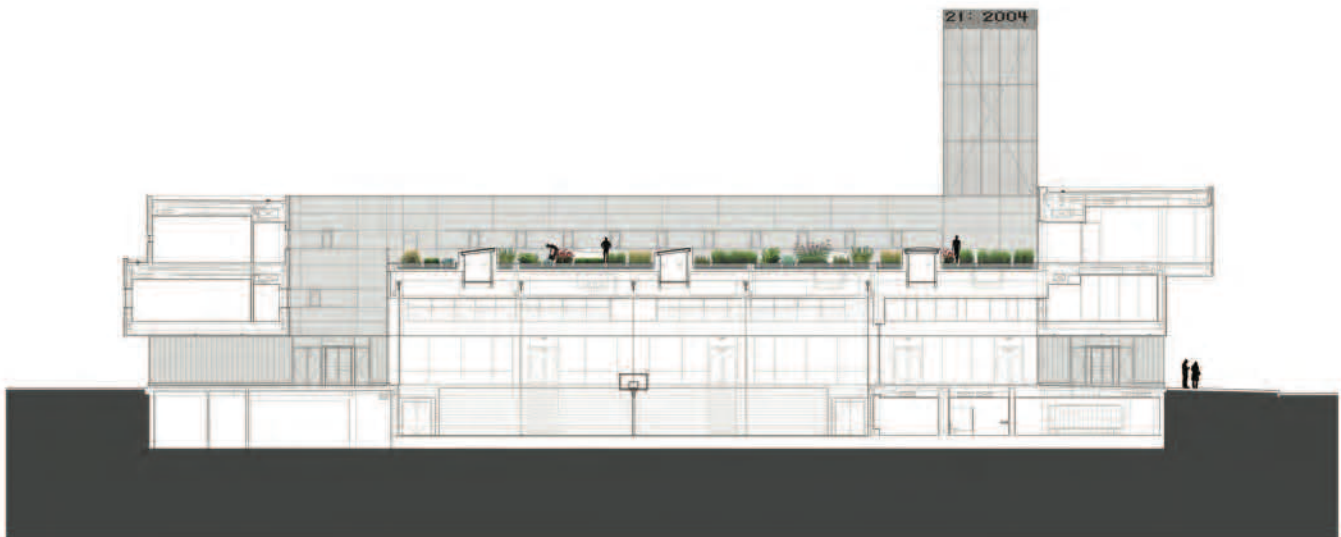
North-South Section of the Gary Comer Youth Center and Rooftop Garden. Image courtesy of Hoerr Schaudt.
